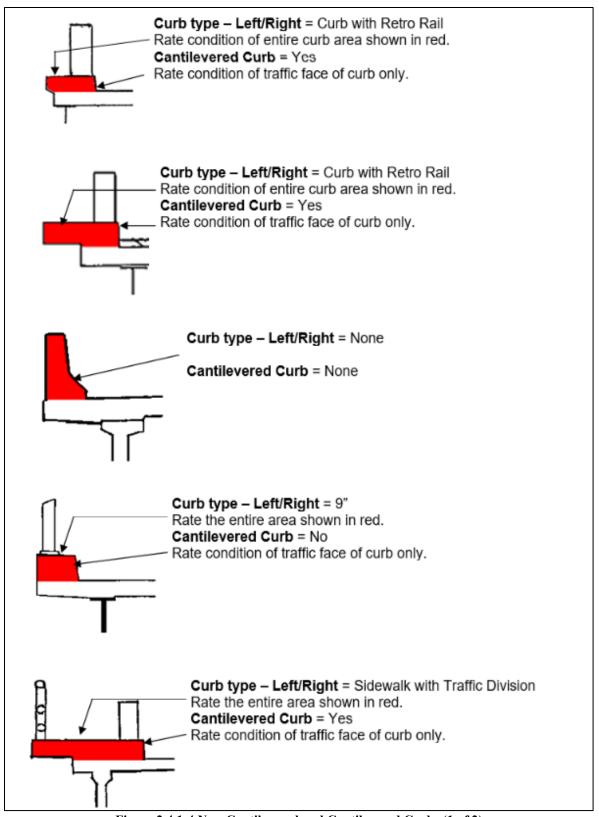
Non-Cantilevered and Cantilevered Curbs (1 of 2)
